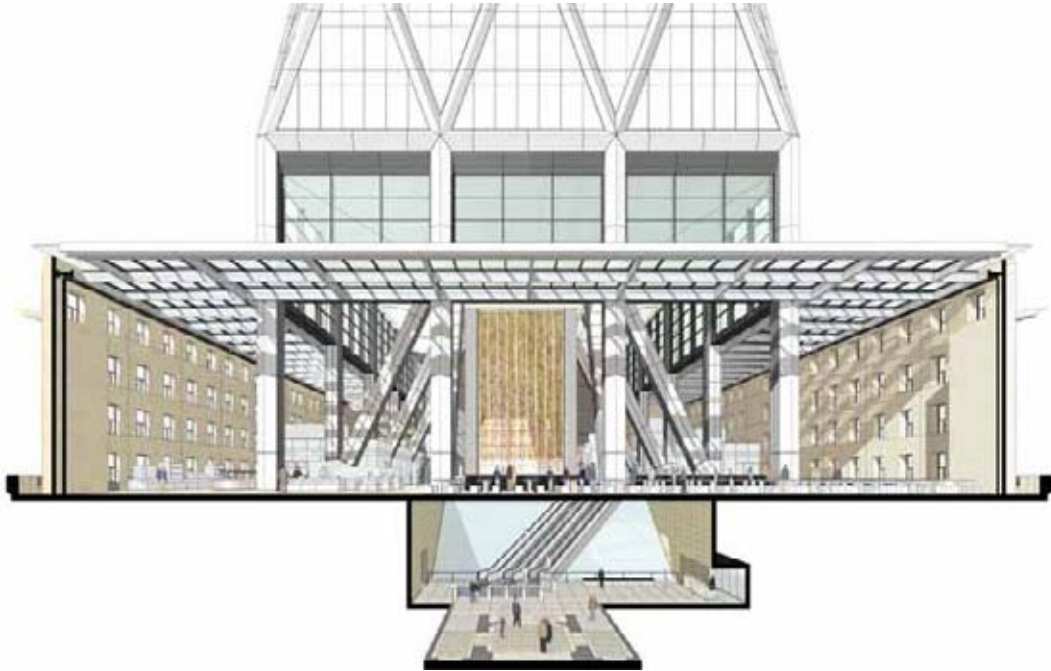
HEARST TOWER SECTION THROUGH THE OLD BUILDING
